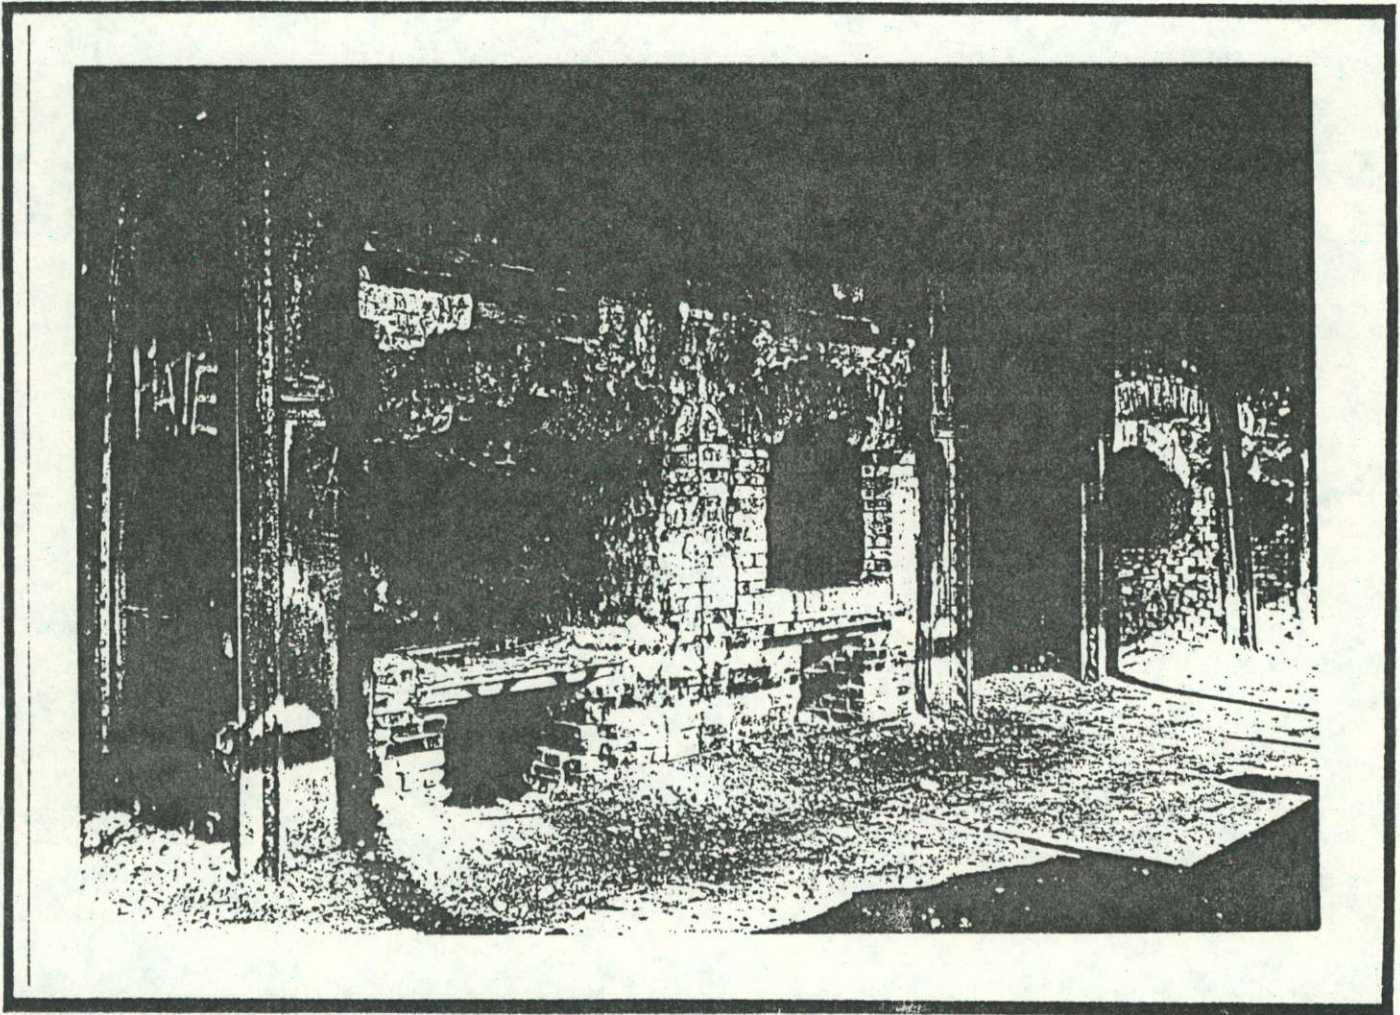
Fireboxes from Which Front Steel Cladding is Removed, Showing Firebrick
